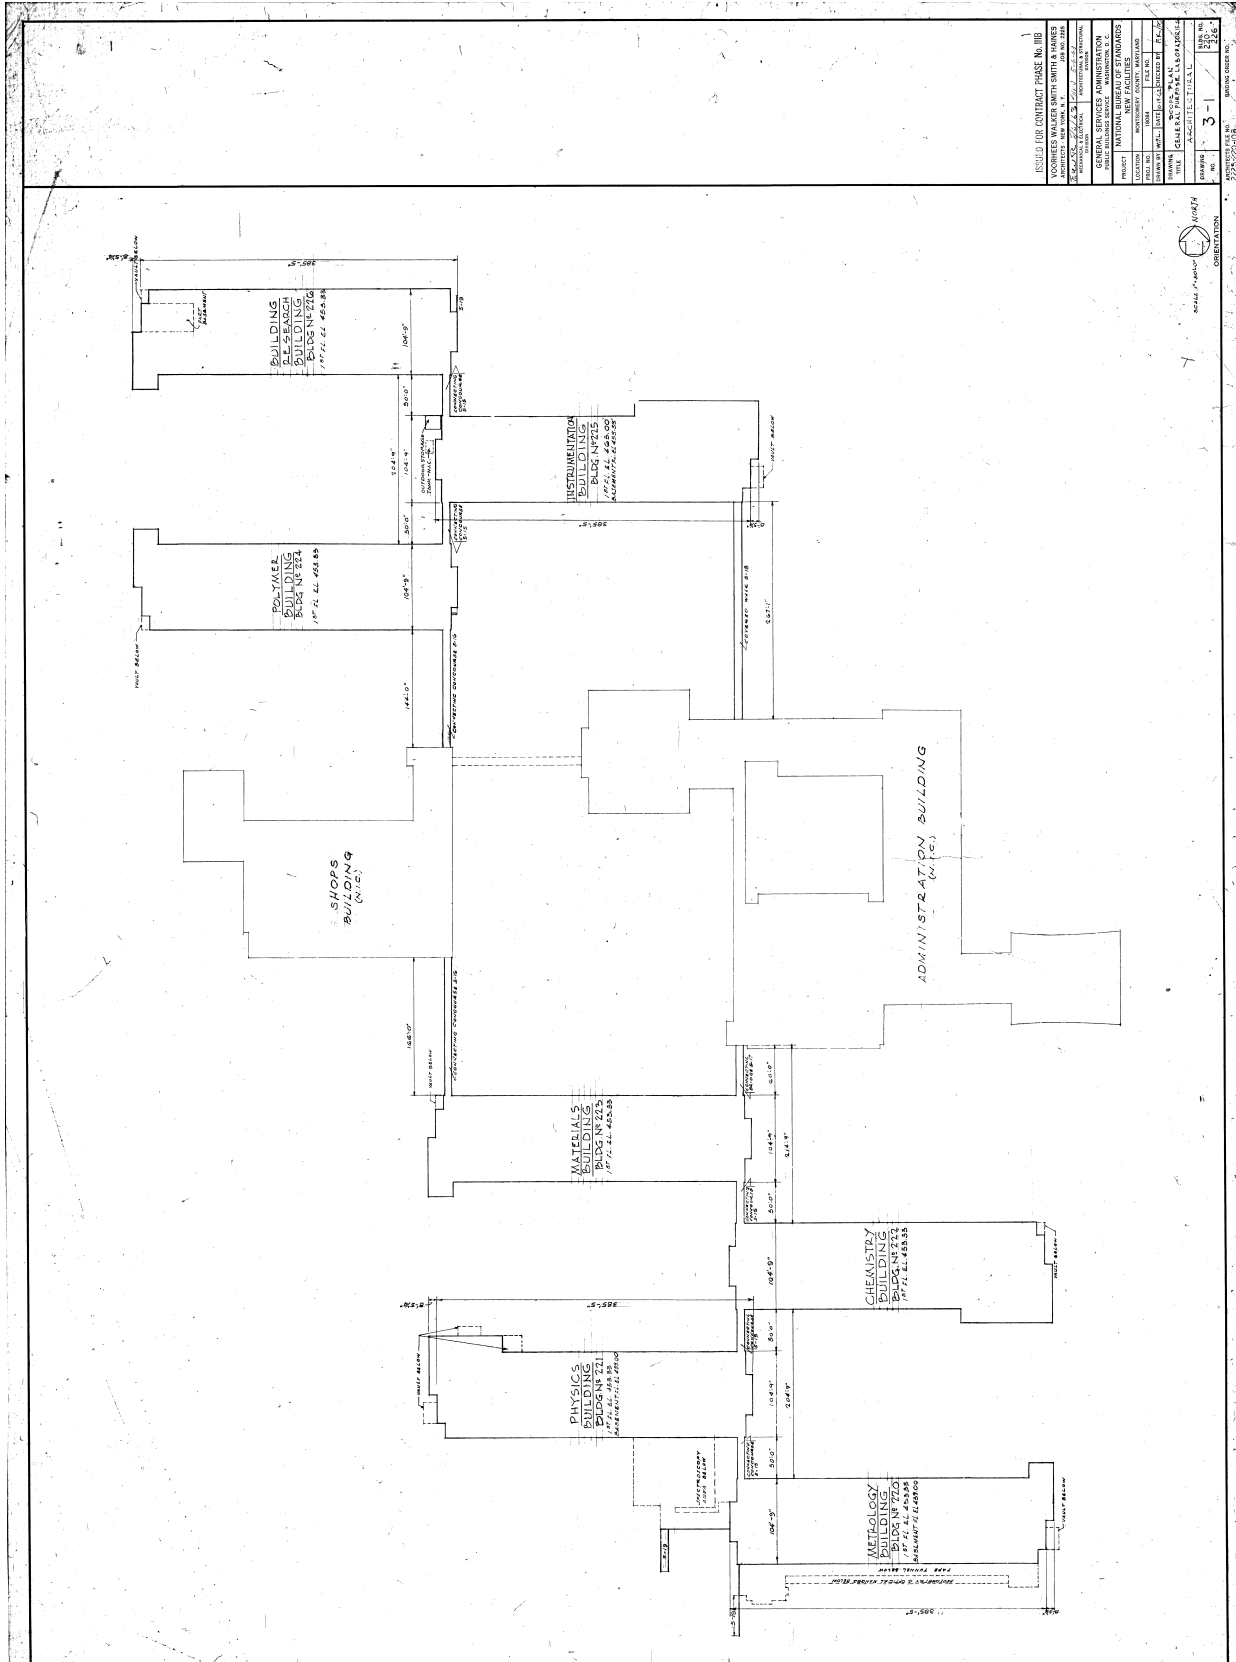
Scope Plan, General Purpose Laboratories (Source: Metropolitan Architects and Planners, Inc.).
